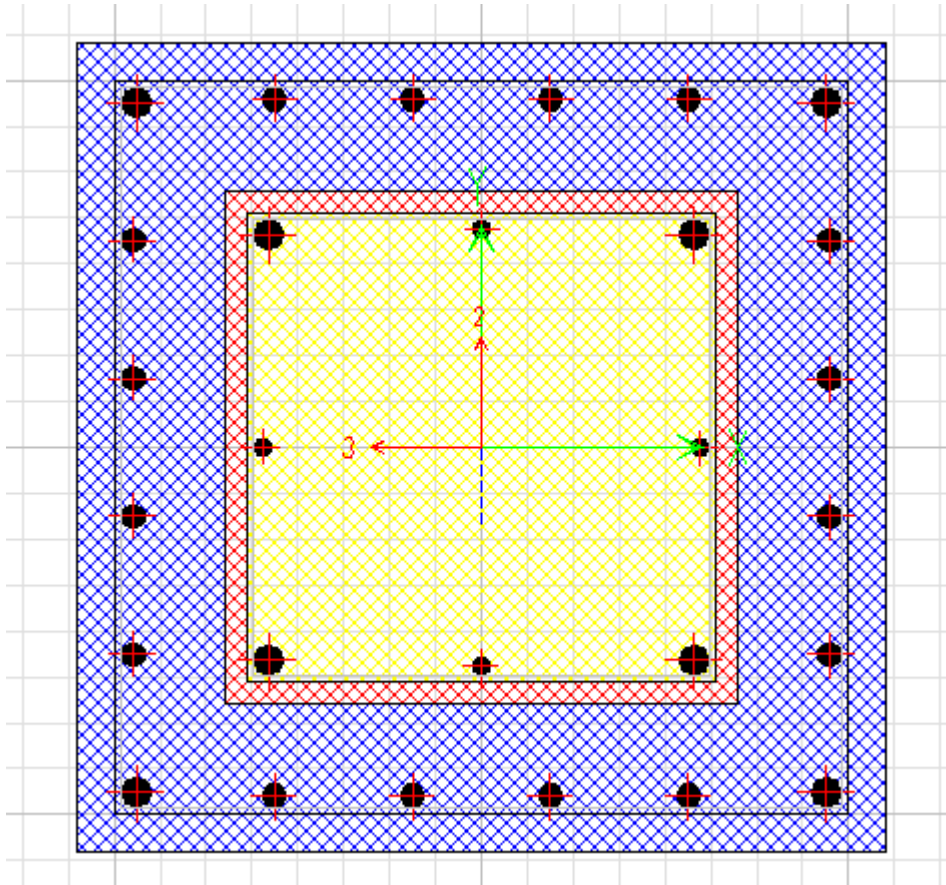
Jacket of Column C5 at the floor level E. Jacket Width:10cm, Reinforcing Steel: 16 Φ 16+ 4 Φ 20 Bar Cover: 4cm
